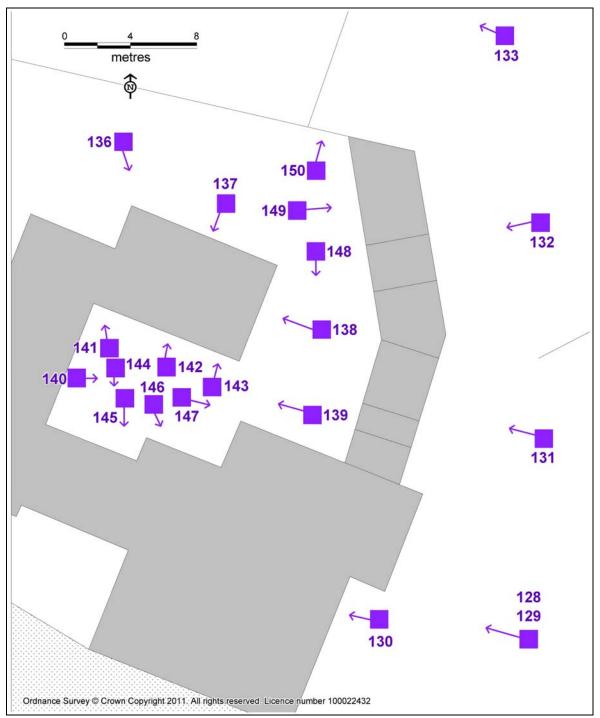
Location of photographs to the north and east of Robeston House, relating to the single storey range to be demolished and the window to be replaced with a doorway
